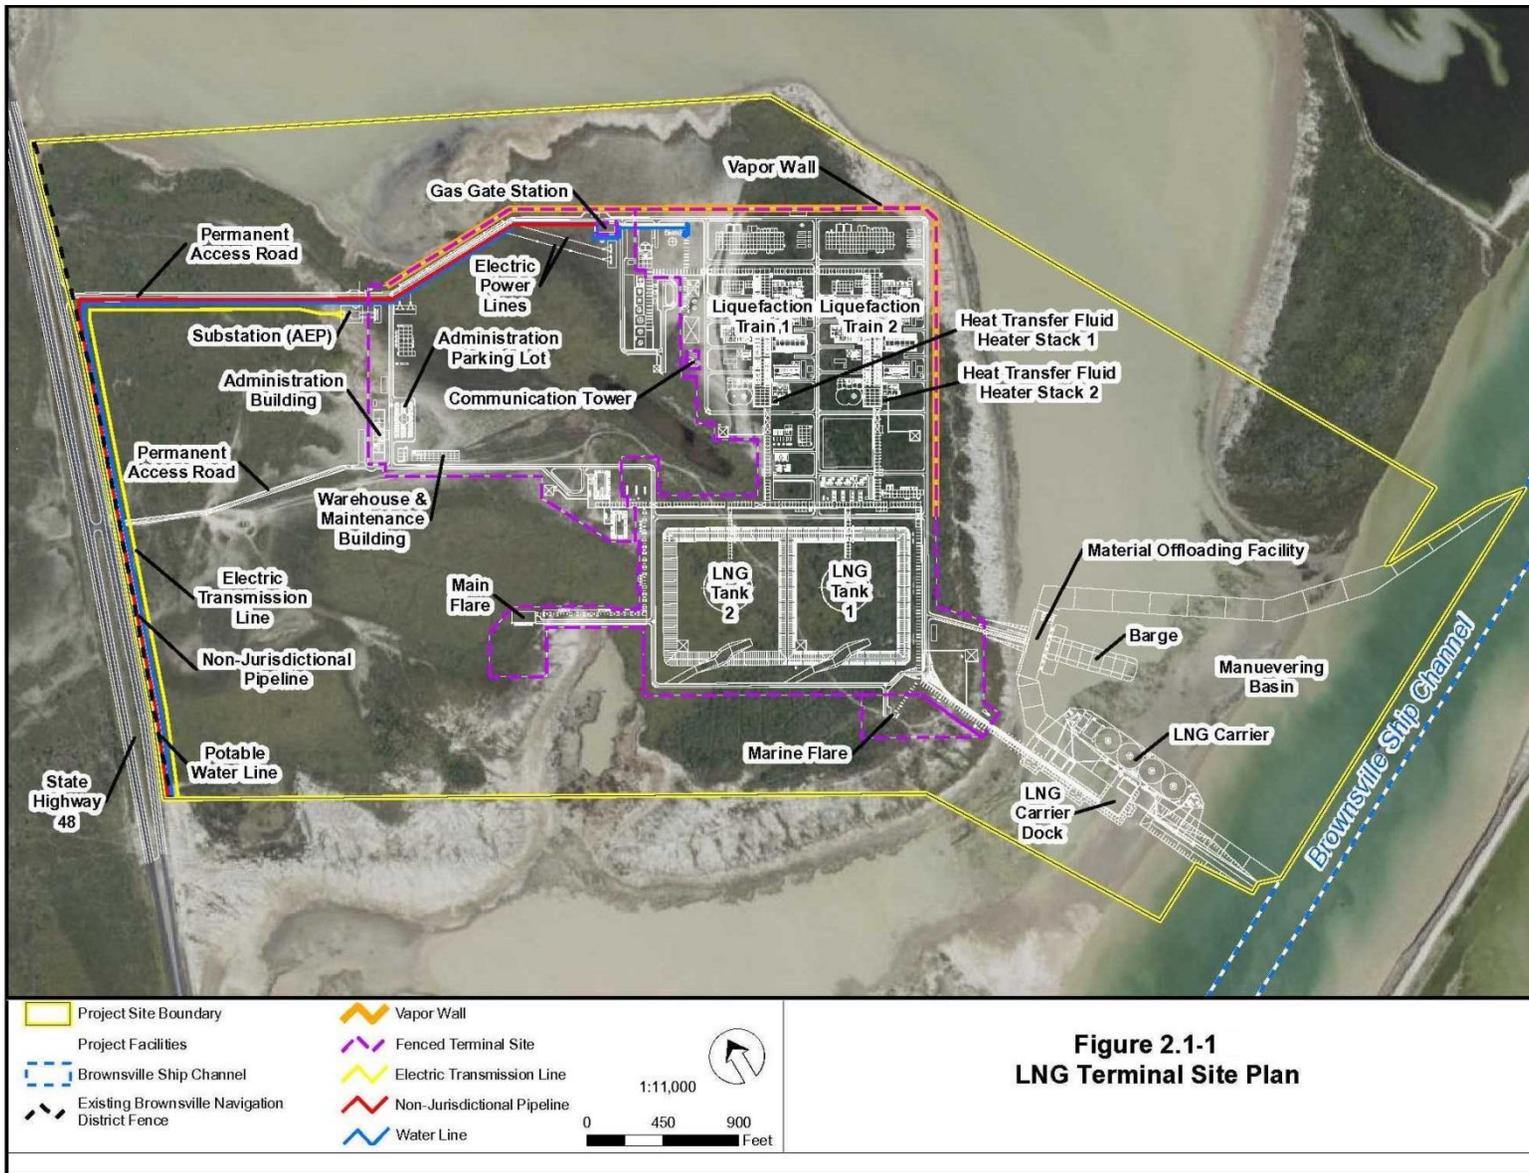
LNG Terminal Site Plan (Aerial Map)
